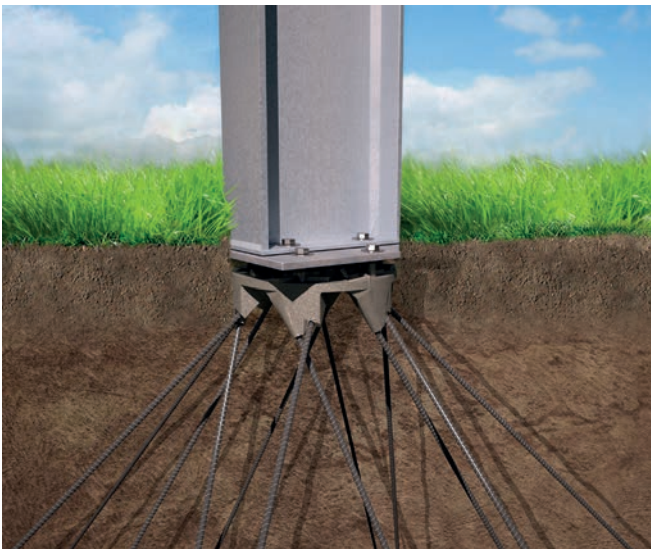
Spinnanker anchor with anchor plate and threaded rods provides the foundation for the installation system.
